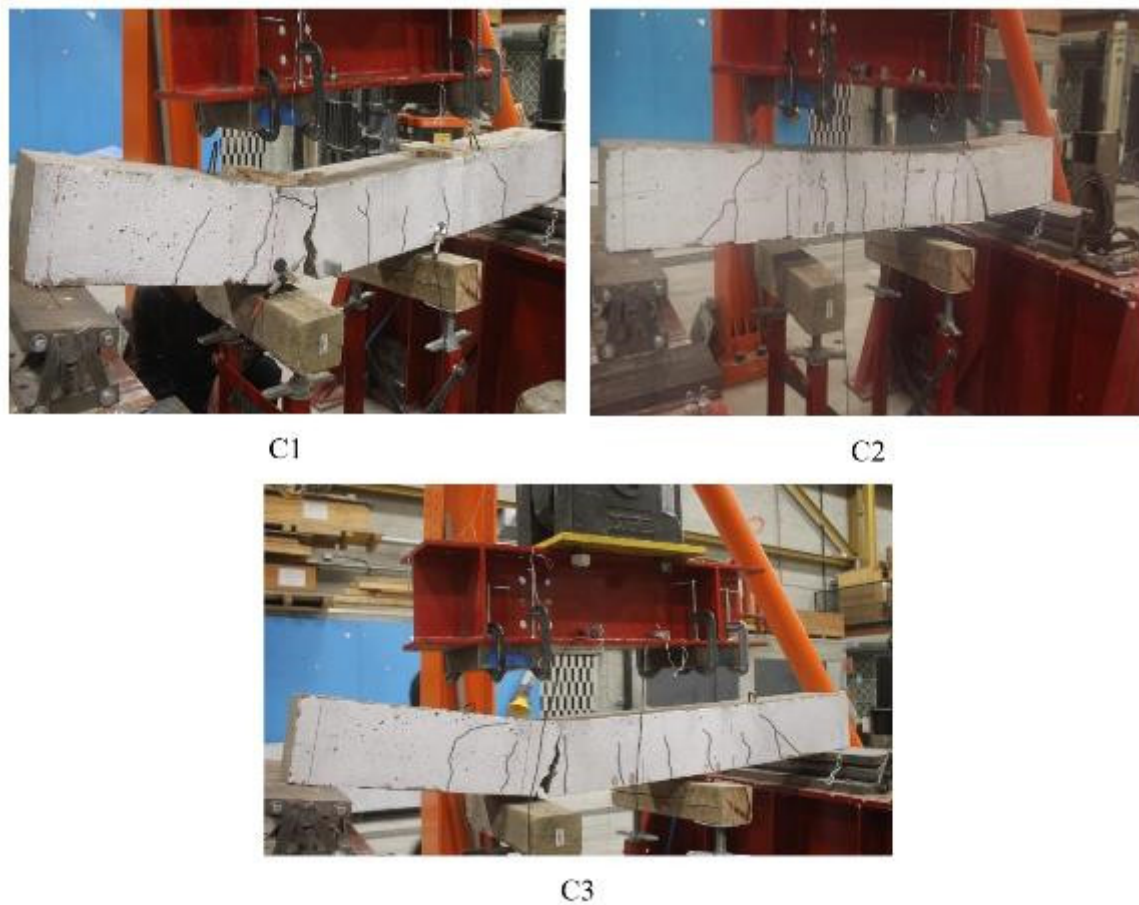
Cracking patterns of the conditioned beams (C1, C2, and C3)
